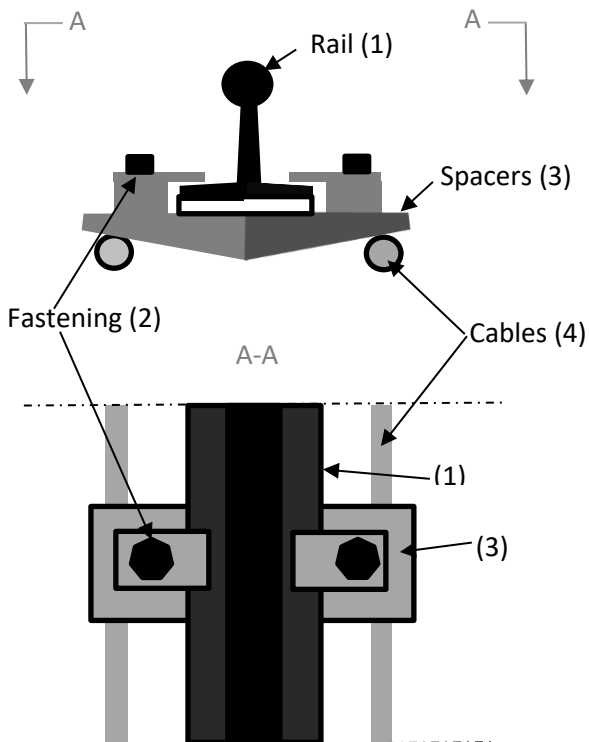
top: Schematic cross-section through the rail-cable attachment system; bottom: top view of the rail. Note: The rail-cable attachment system consists of two rails and four cables.
